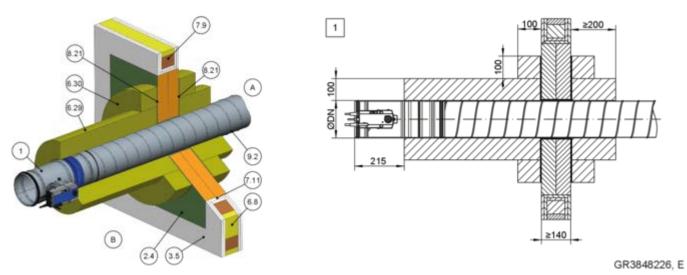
Dry mortarless installation remote from timber frame walls with mineral wool and coated board system
